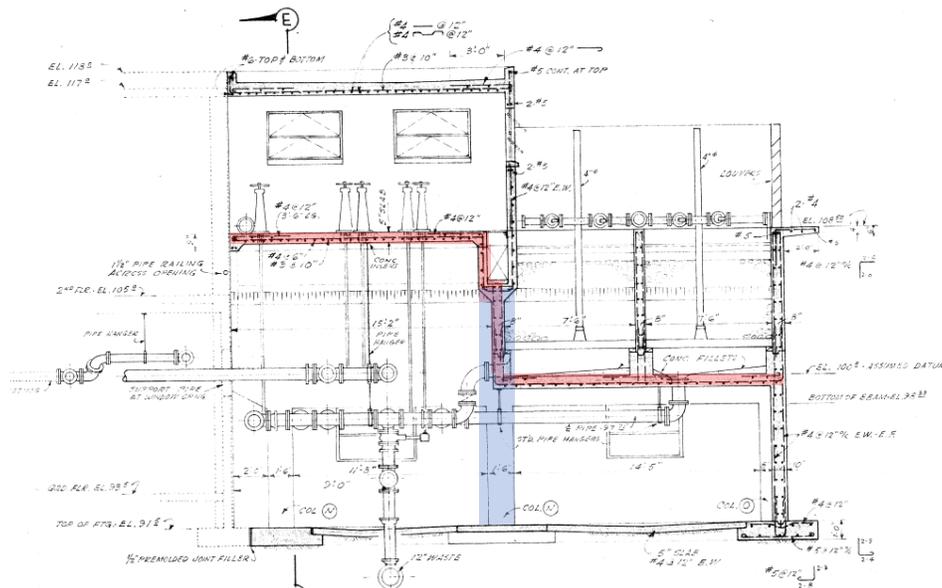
Shear Wall not Continuous to Foundation (Blue Shaded) and with Split Level Diaphragms (Red Shaded)
